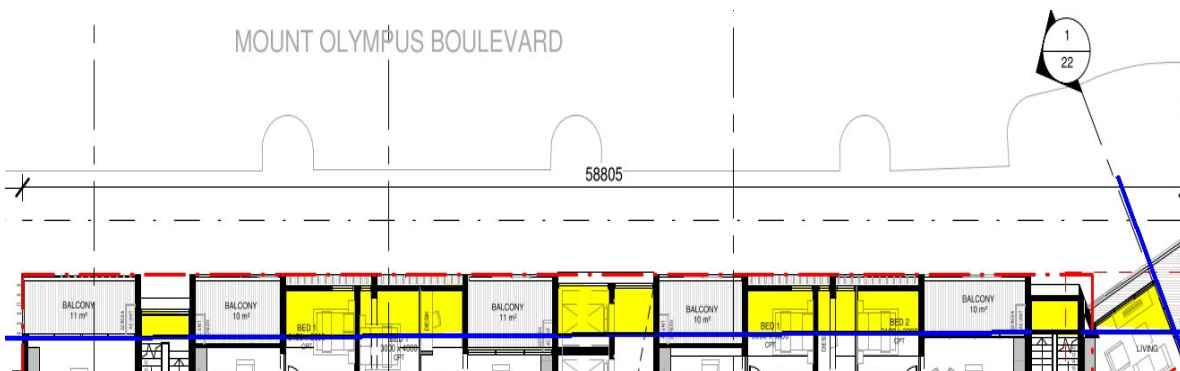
Building element protrusions to Mount Olympus Boulevard
